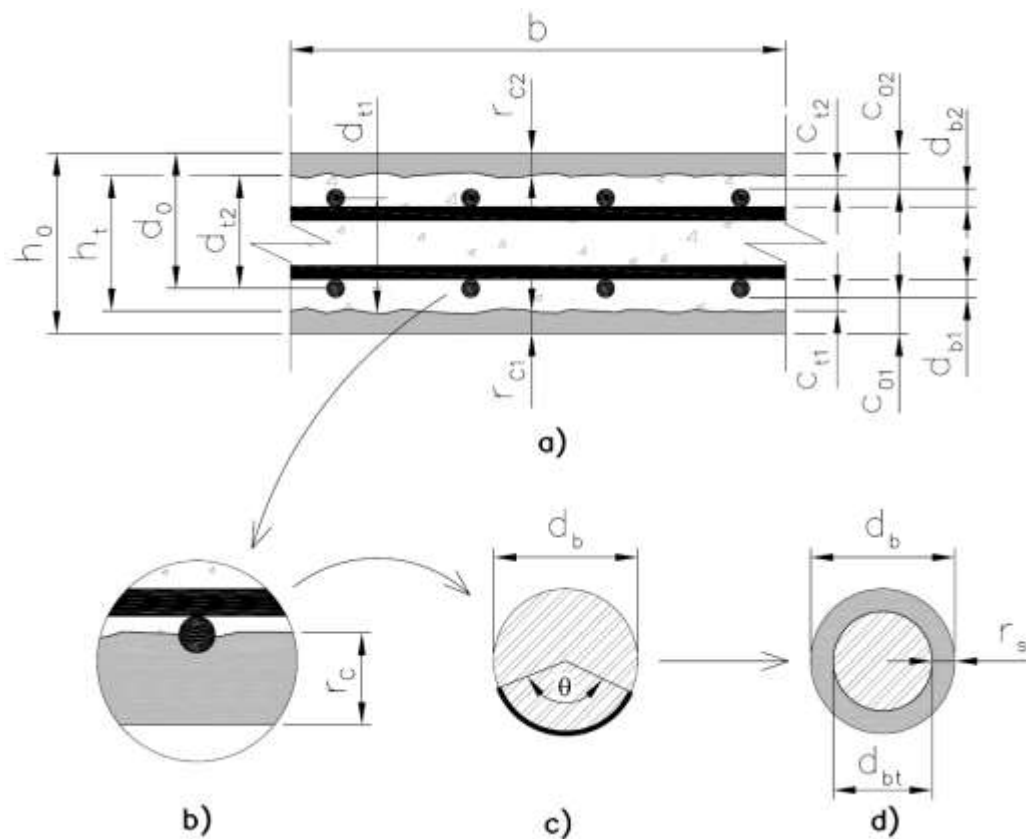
Reinforced concrete section parameters for the structural and durability design (Ji 2003)
